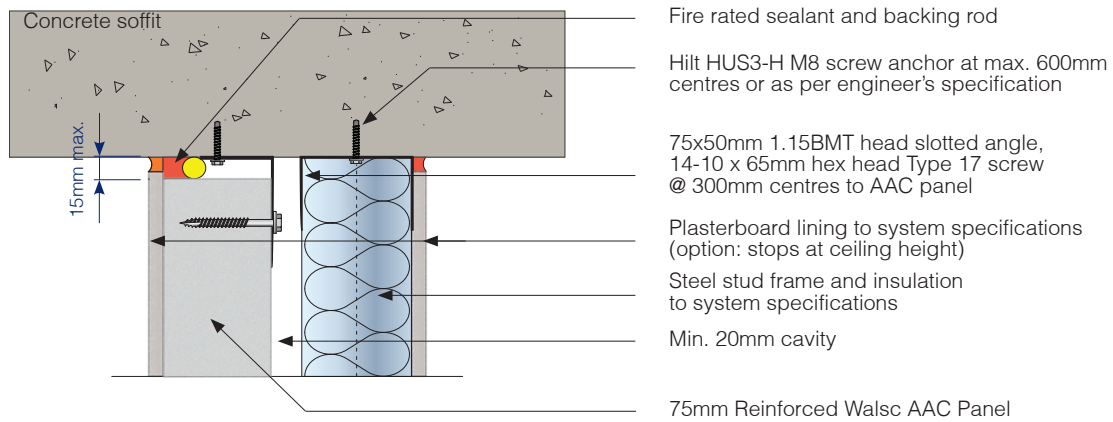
Internal Cavity Wall System Top Fixing Detail (Head Slotted Angle)
